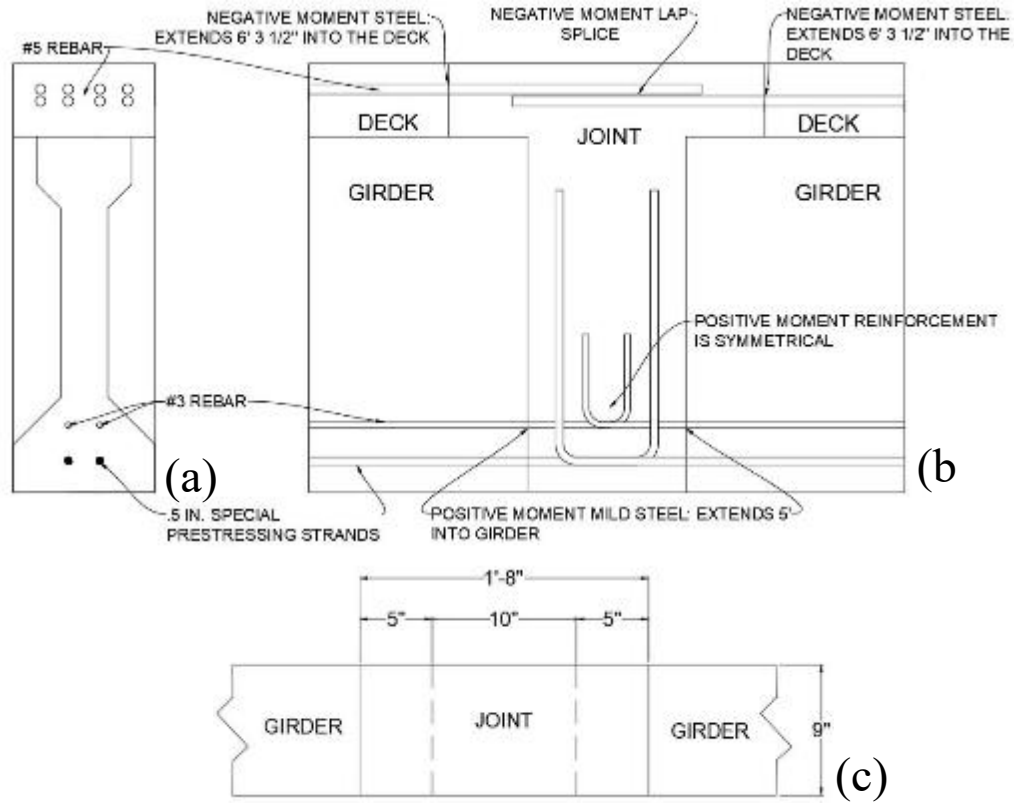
Newly constructed continuity joint cross-section (a), elevation view, (b), and plan view (c)
